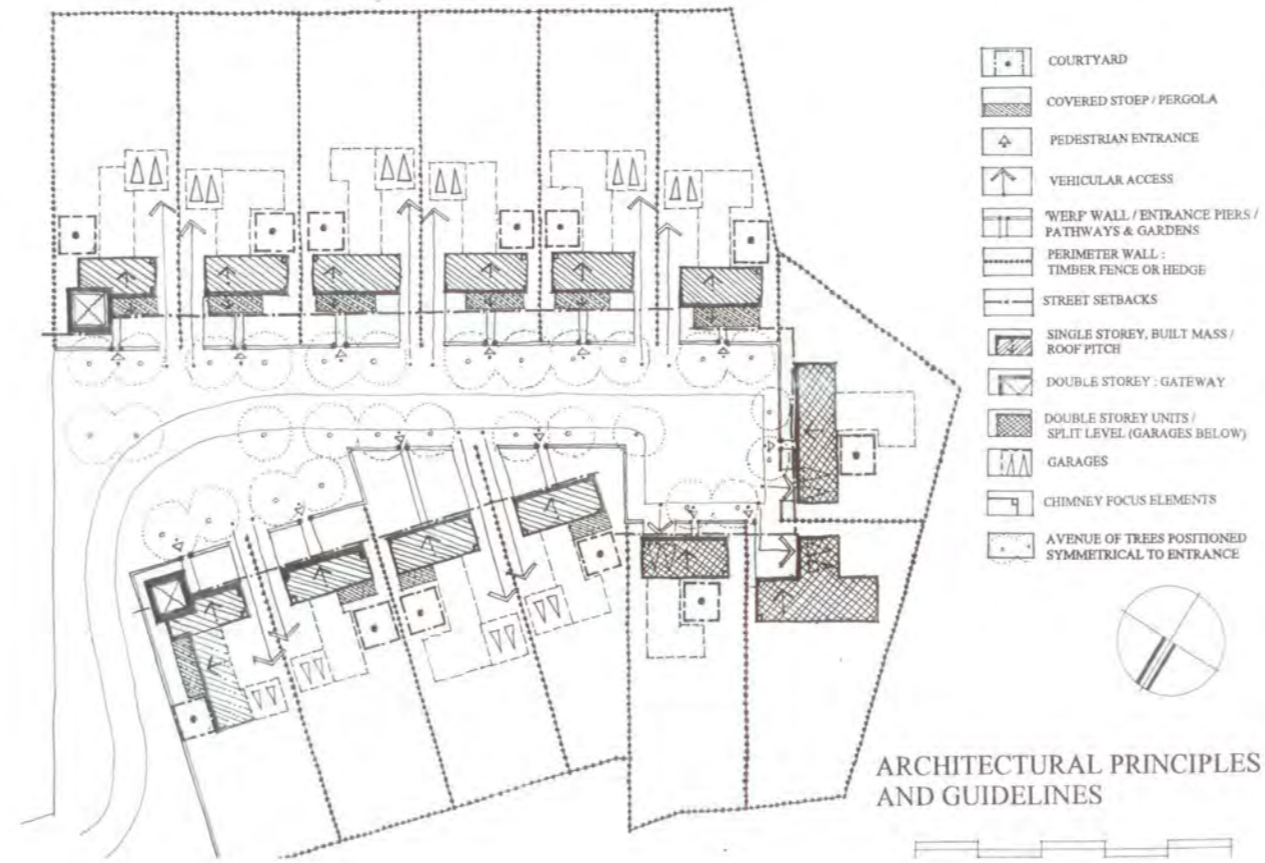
Prototypical Example of Making Settlement Through Architectural Controls and Guidelines - P. Louw & M. Kruger: A family of public spaces, spaces, not movement, as the primary structural elements, qualities of street, using buildings to define
